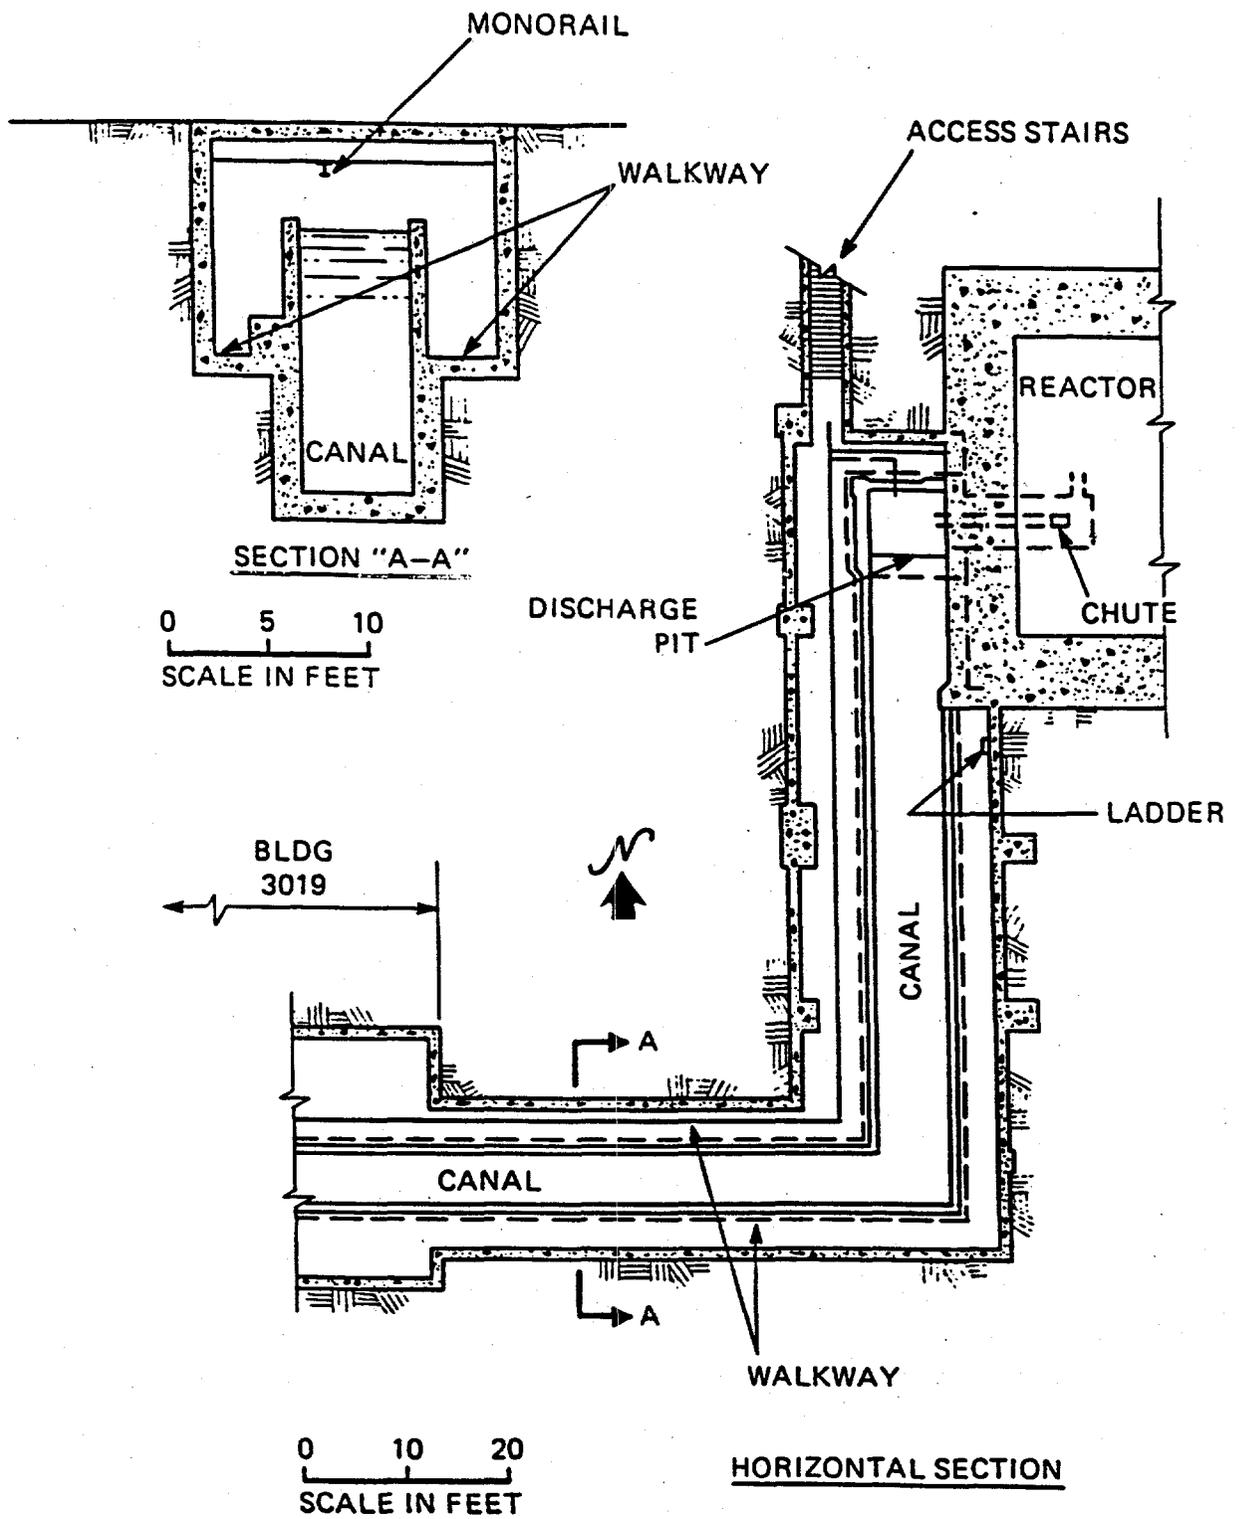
Building 3001 Canal Plan View and Typical Section
